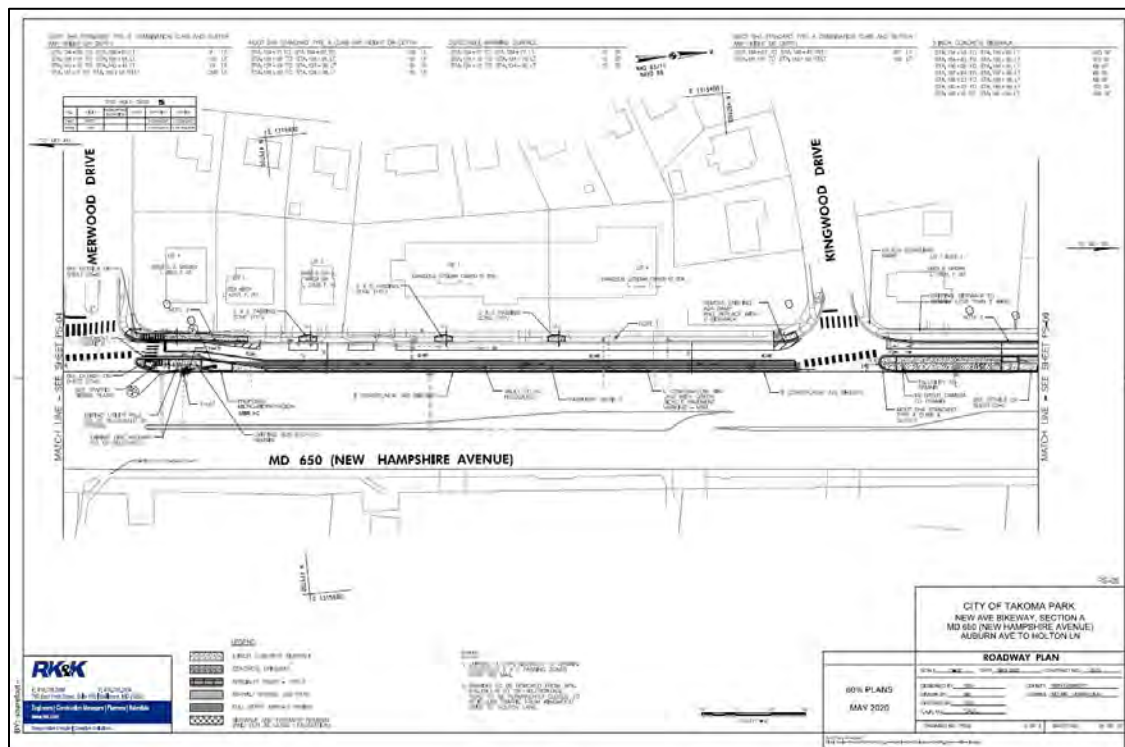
Plan View of Proposed New Avenue Section A Improvements (Part 5)
